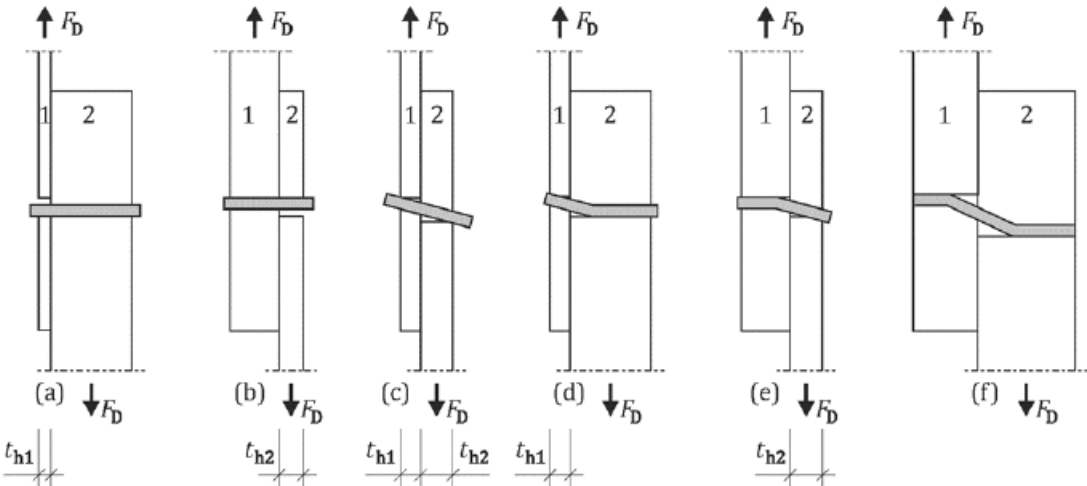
Failure modes (a) to (f) for a fastener loaded in single shear plane [1].
